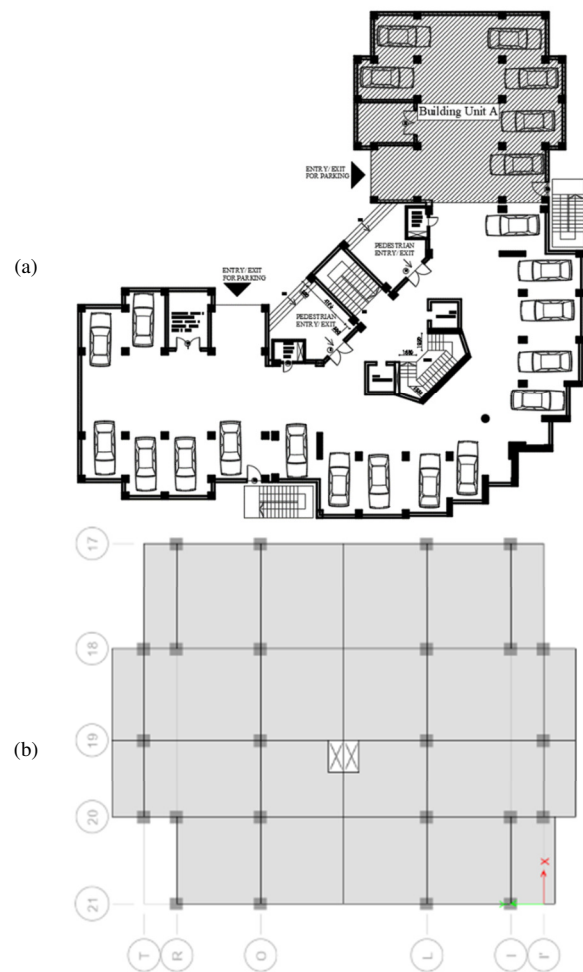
Ground floor plan of the case study building: (a) typical plan layout, (b) grid layout of hatch portion in the analytical model.
